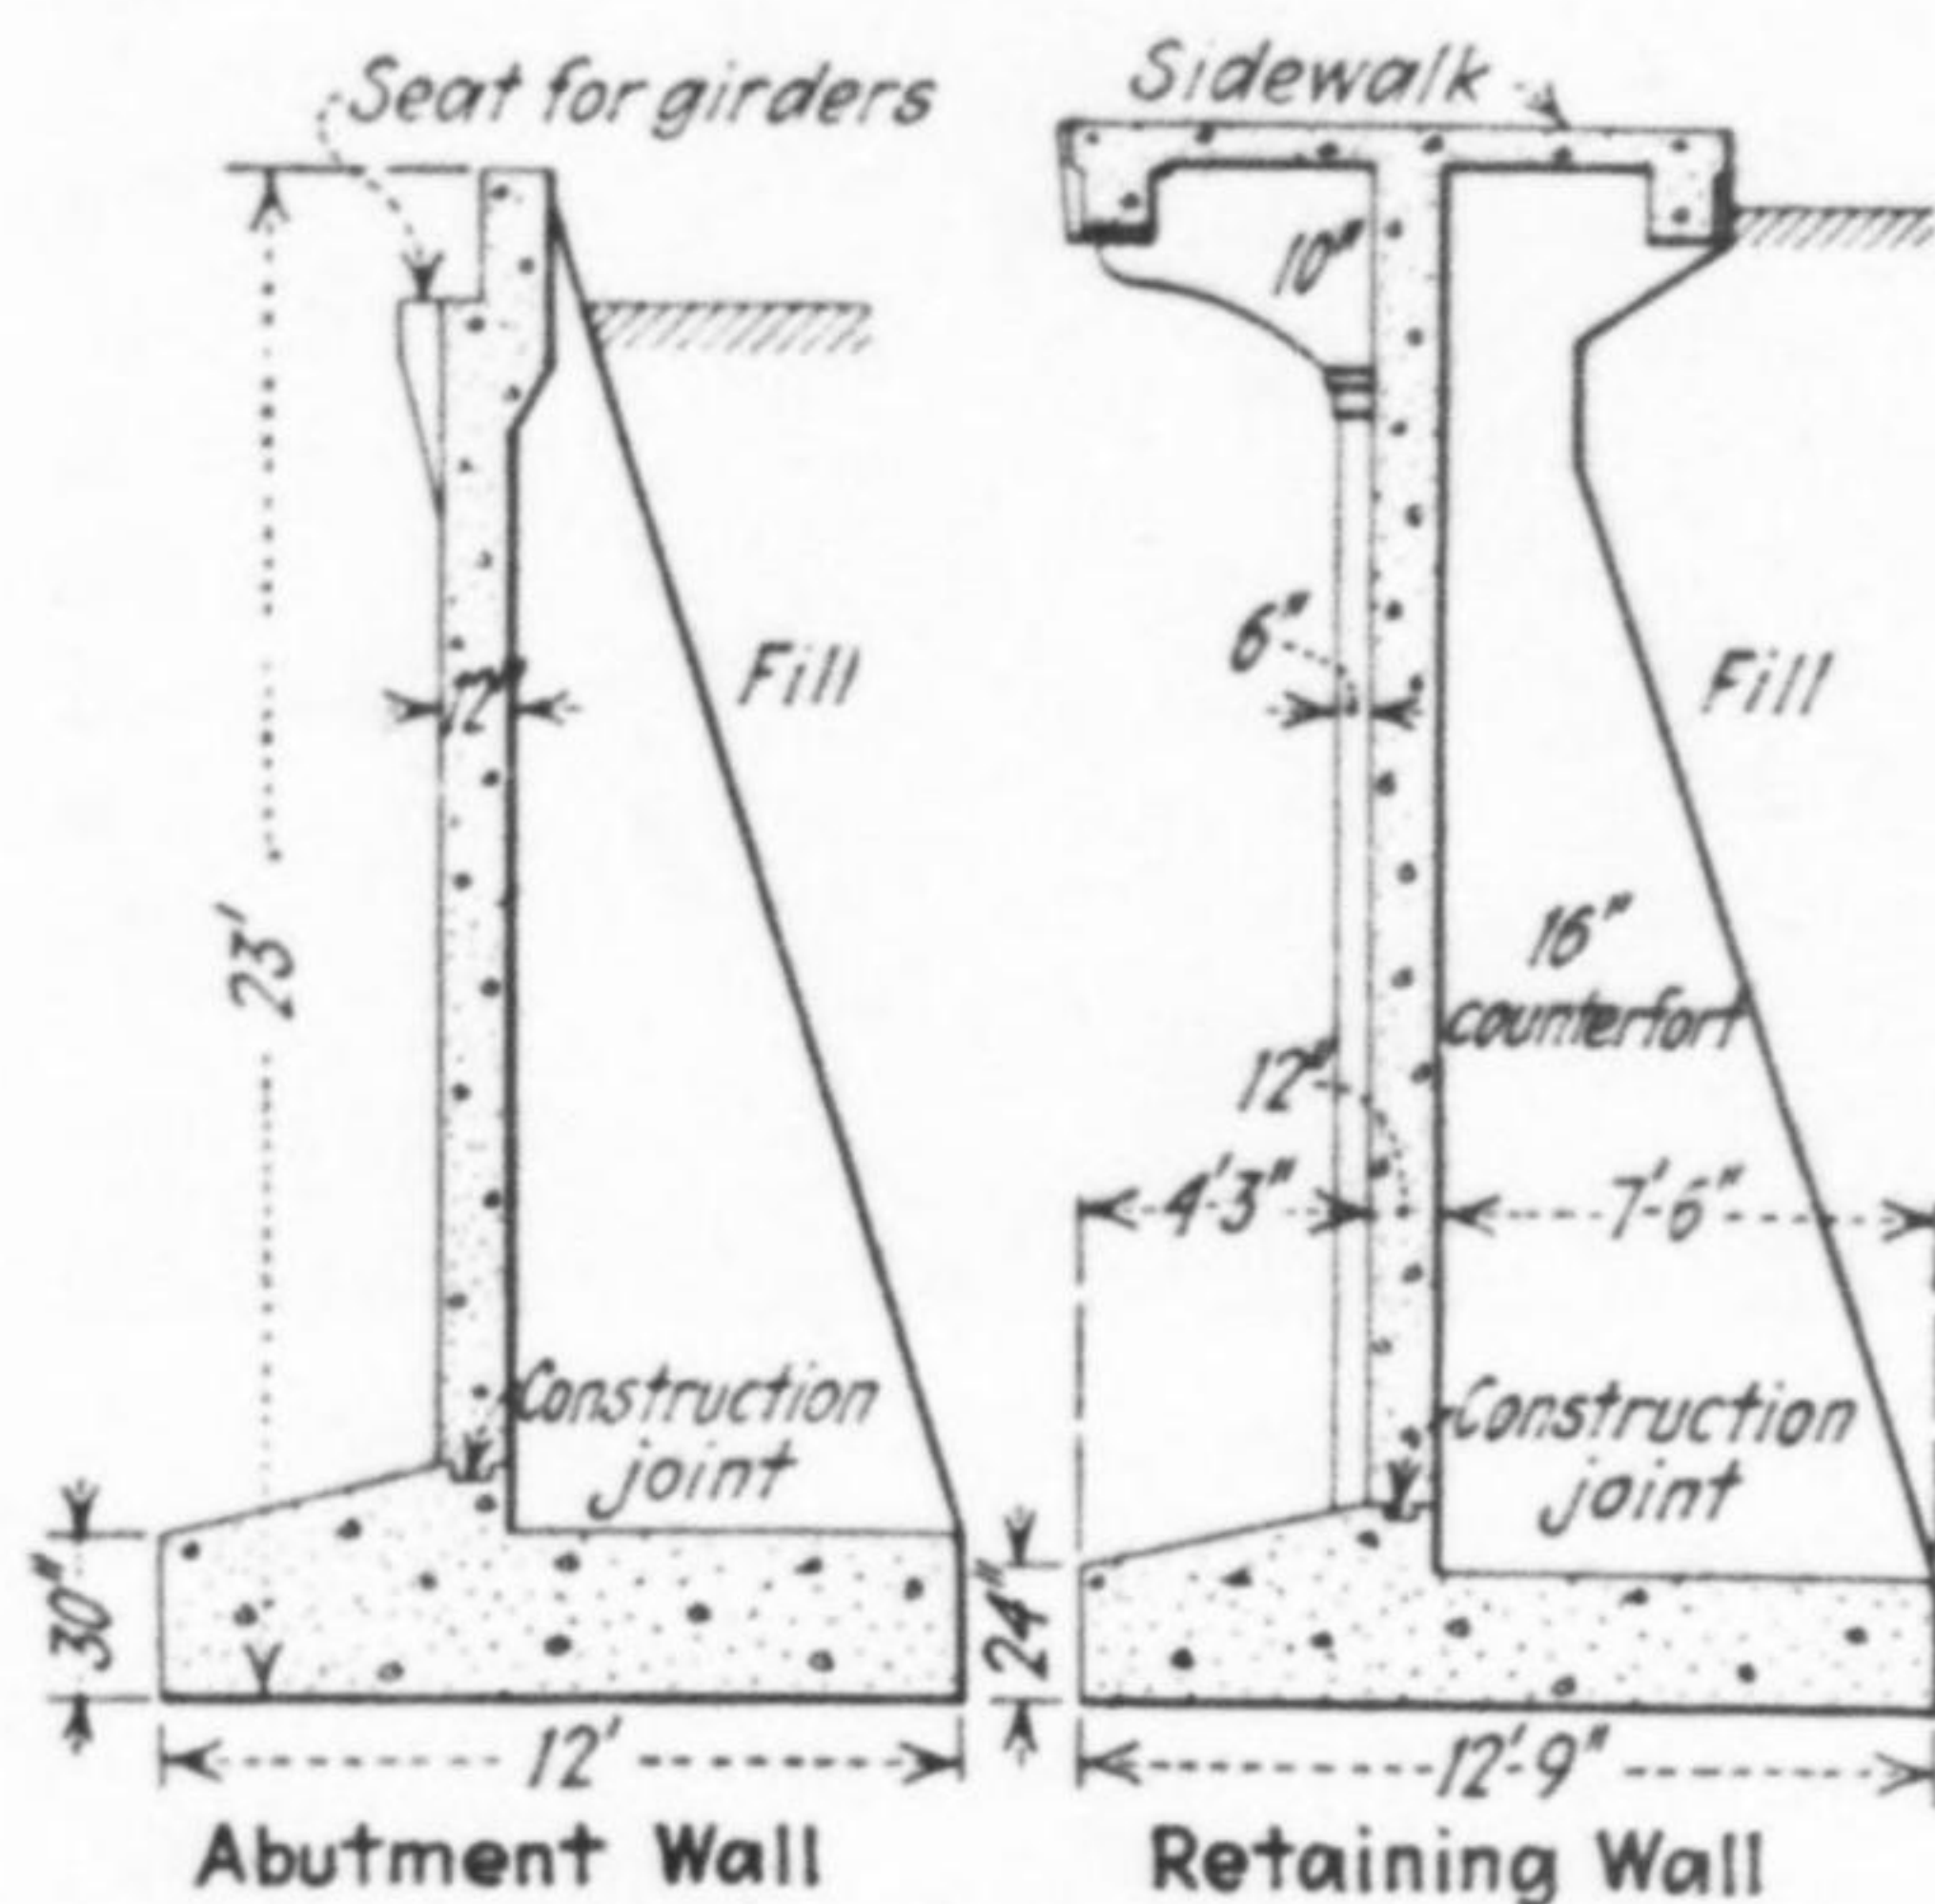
Walls for filled approaches. Note T-head retaining walls forming sidewalks.
